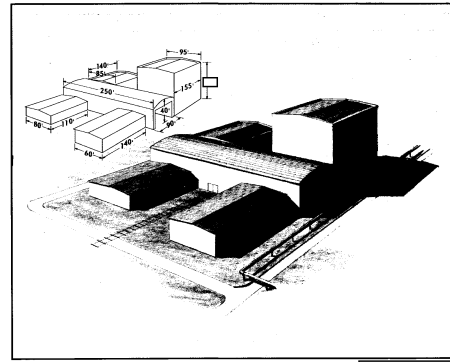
PERSPECTIVE VIEW OF H-SHAPED CHECKOUT/ASSEMBLY BUILDING AT TEST FACILITY.
